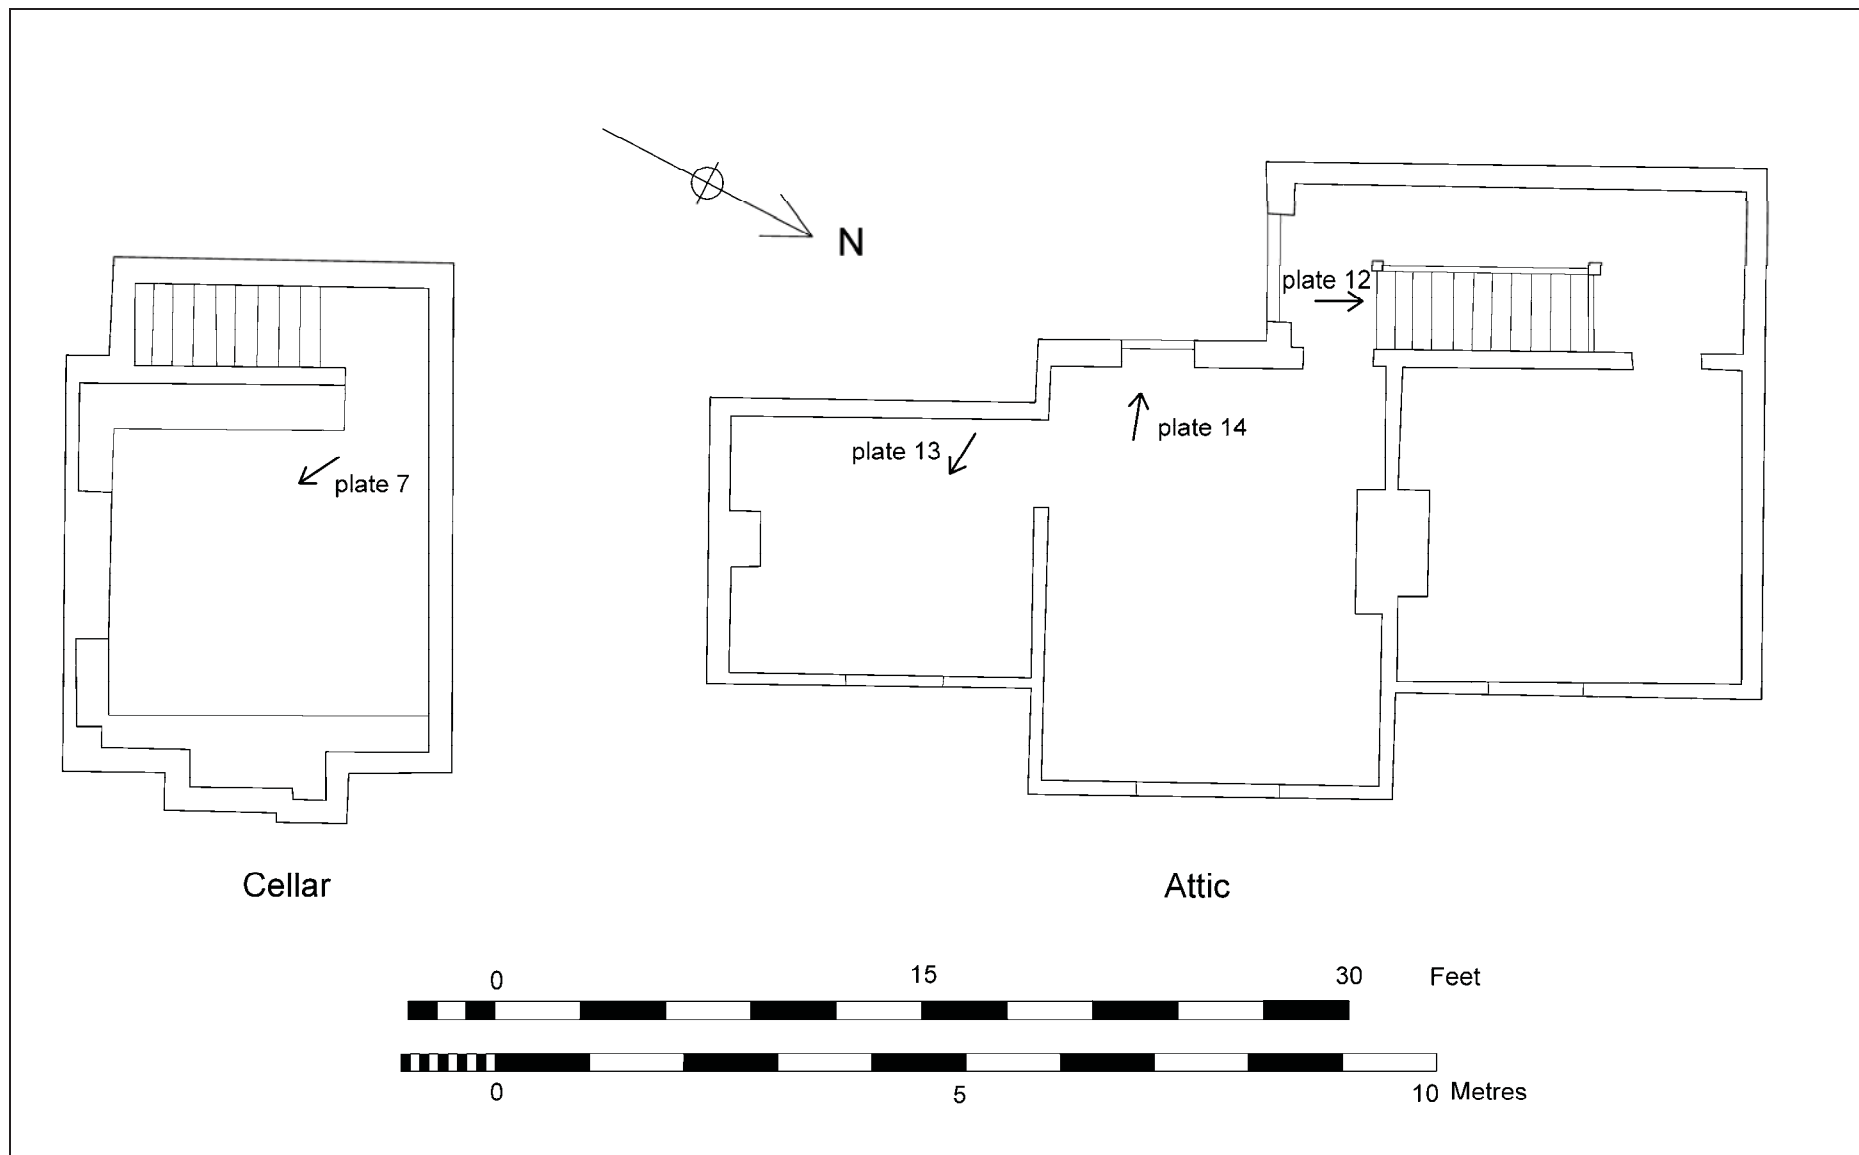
No. 4 Northgate Street, cellar and attic floor plan, with locations of plates added.
